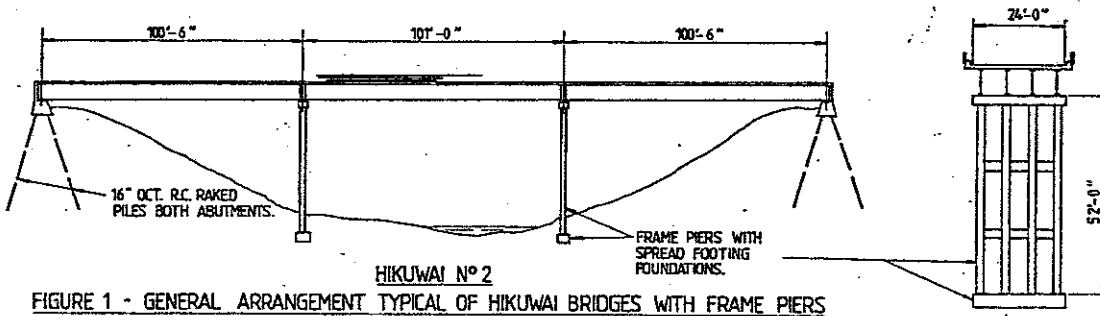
GENERAL ARRANGEMENT TYPICAL OF HIKUWAI BRIDGES WITH FRAME PIERS
